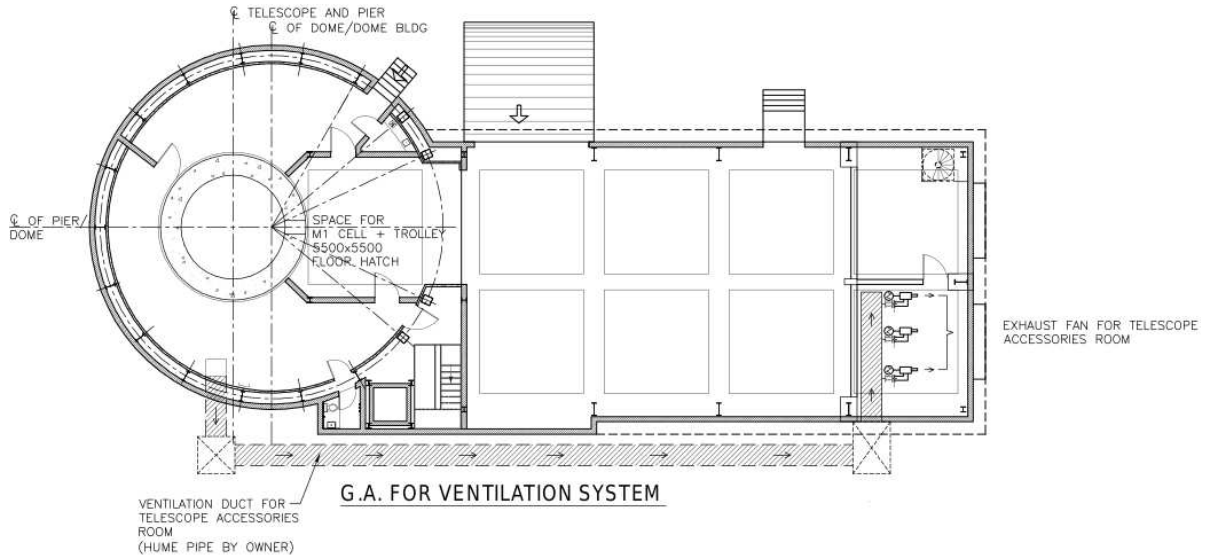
The floor plan of the 3.6-m DOT dome and the extension building. The extension building will house the aluminising plant (see §4.3.)
